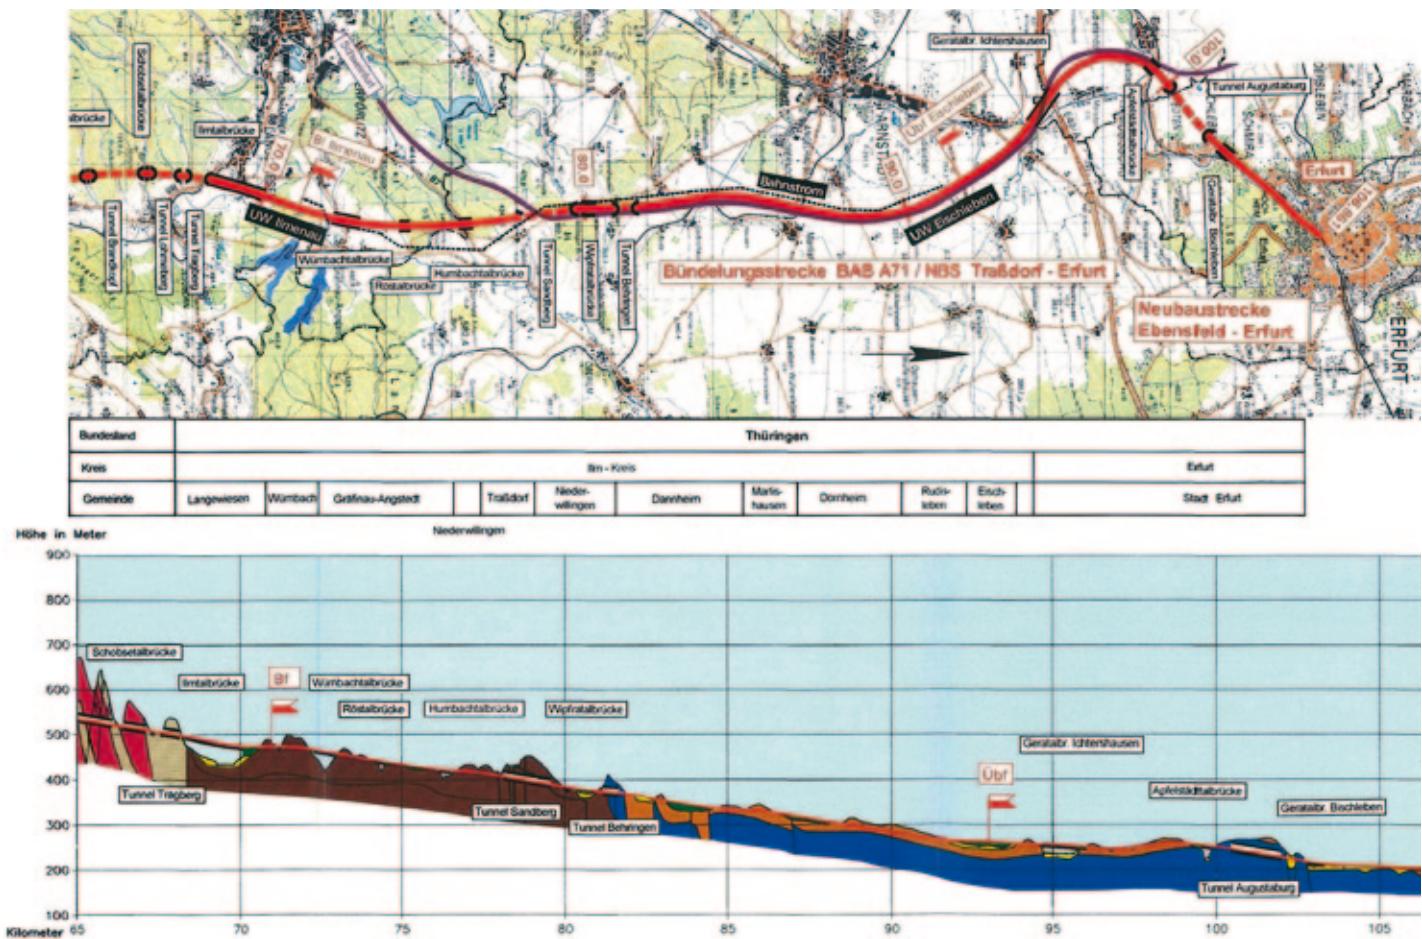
, Ballastless track Ilmenau – Erfurt, line overview, situation plan and longitudinal section; around 32 km long newly built section
